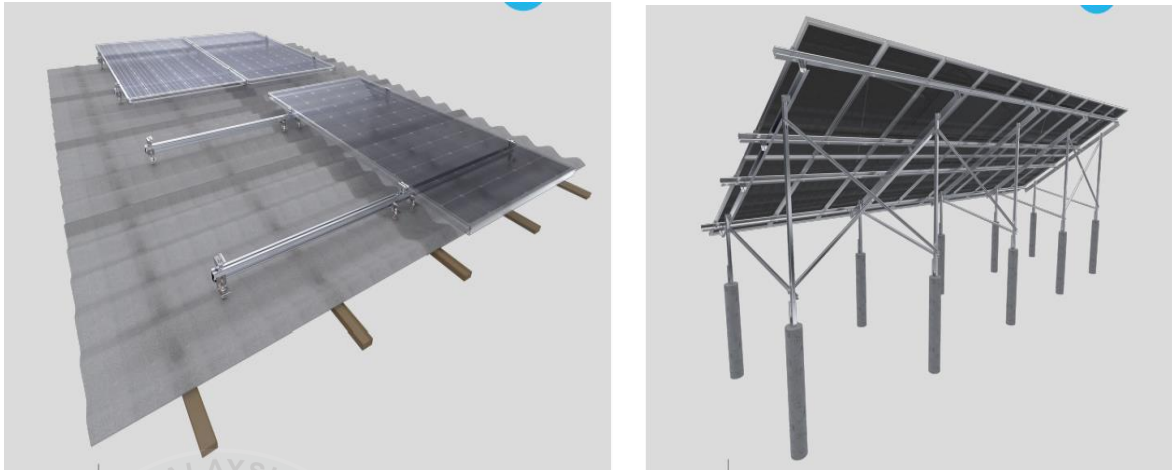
Left show the Roof-mounted structure design while on the right show the Ground-mounted structure design [18]
